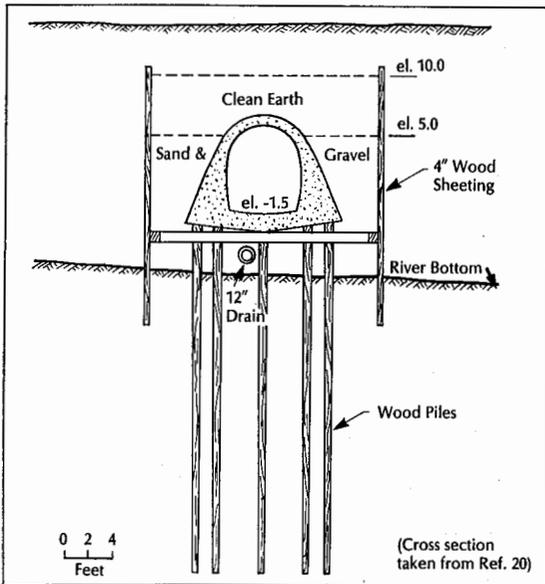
A typical cross section of the Boston Marginal Conduit.
